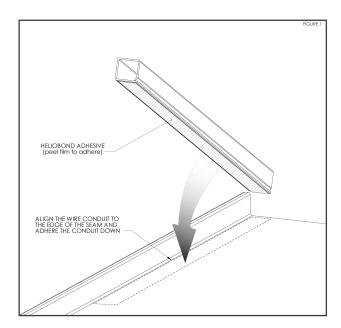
Showing the adhesive on the wire conduit being installed on one side of the standing seam.
